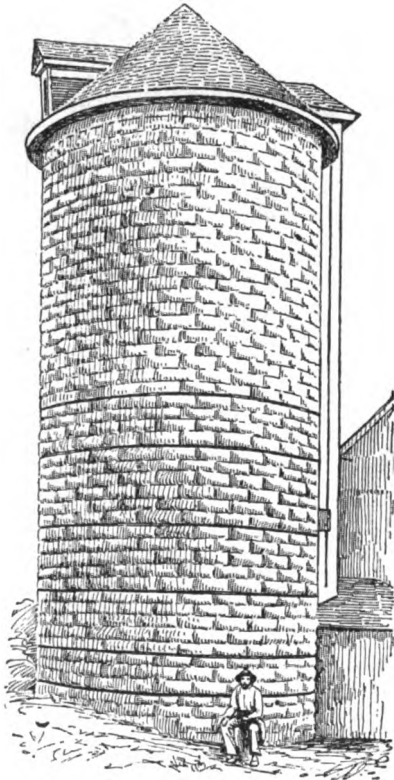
The concrete-block silo is well suited to the needs and constructive ability of the average farmer. It must be well reinforced.
